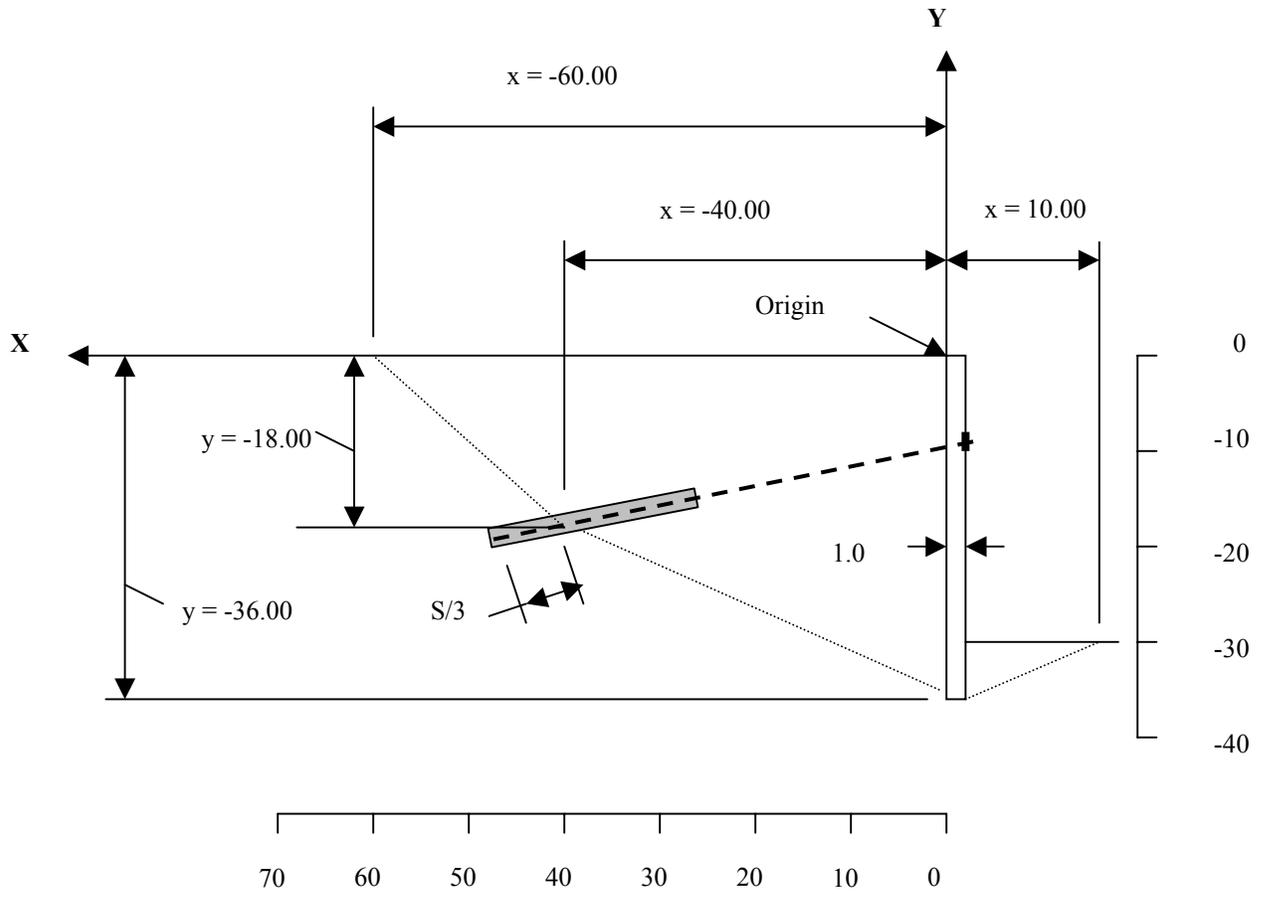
CSLIDE analysis for 30-ft-high wall—anchor location, retained soil half submerged
